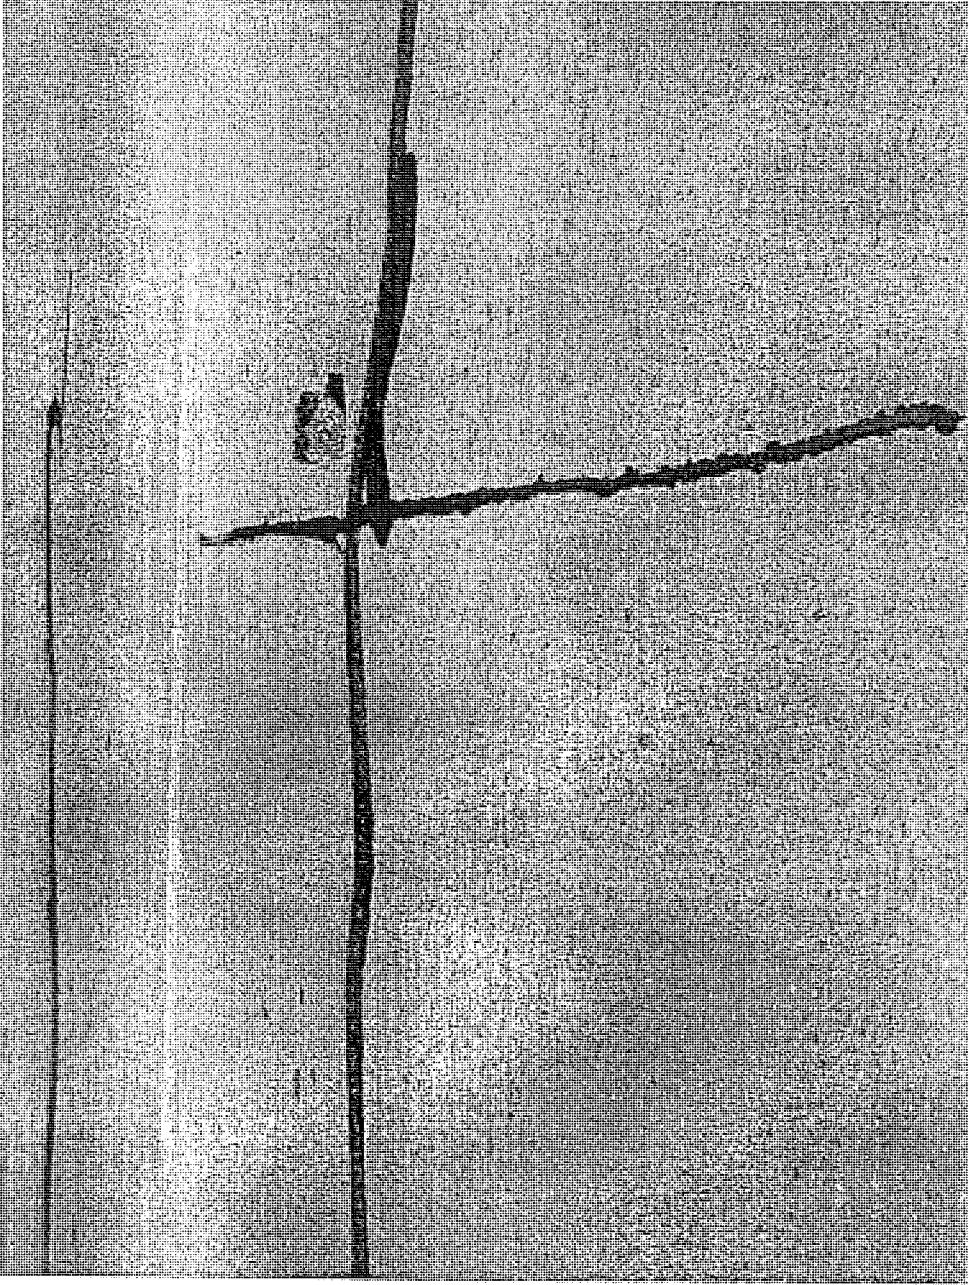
Reflective joint cracking on M-50, Control Section 46082 Job Number 30388 BMP 3.9 EMP 4.4
